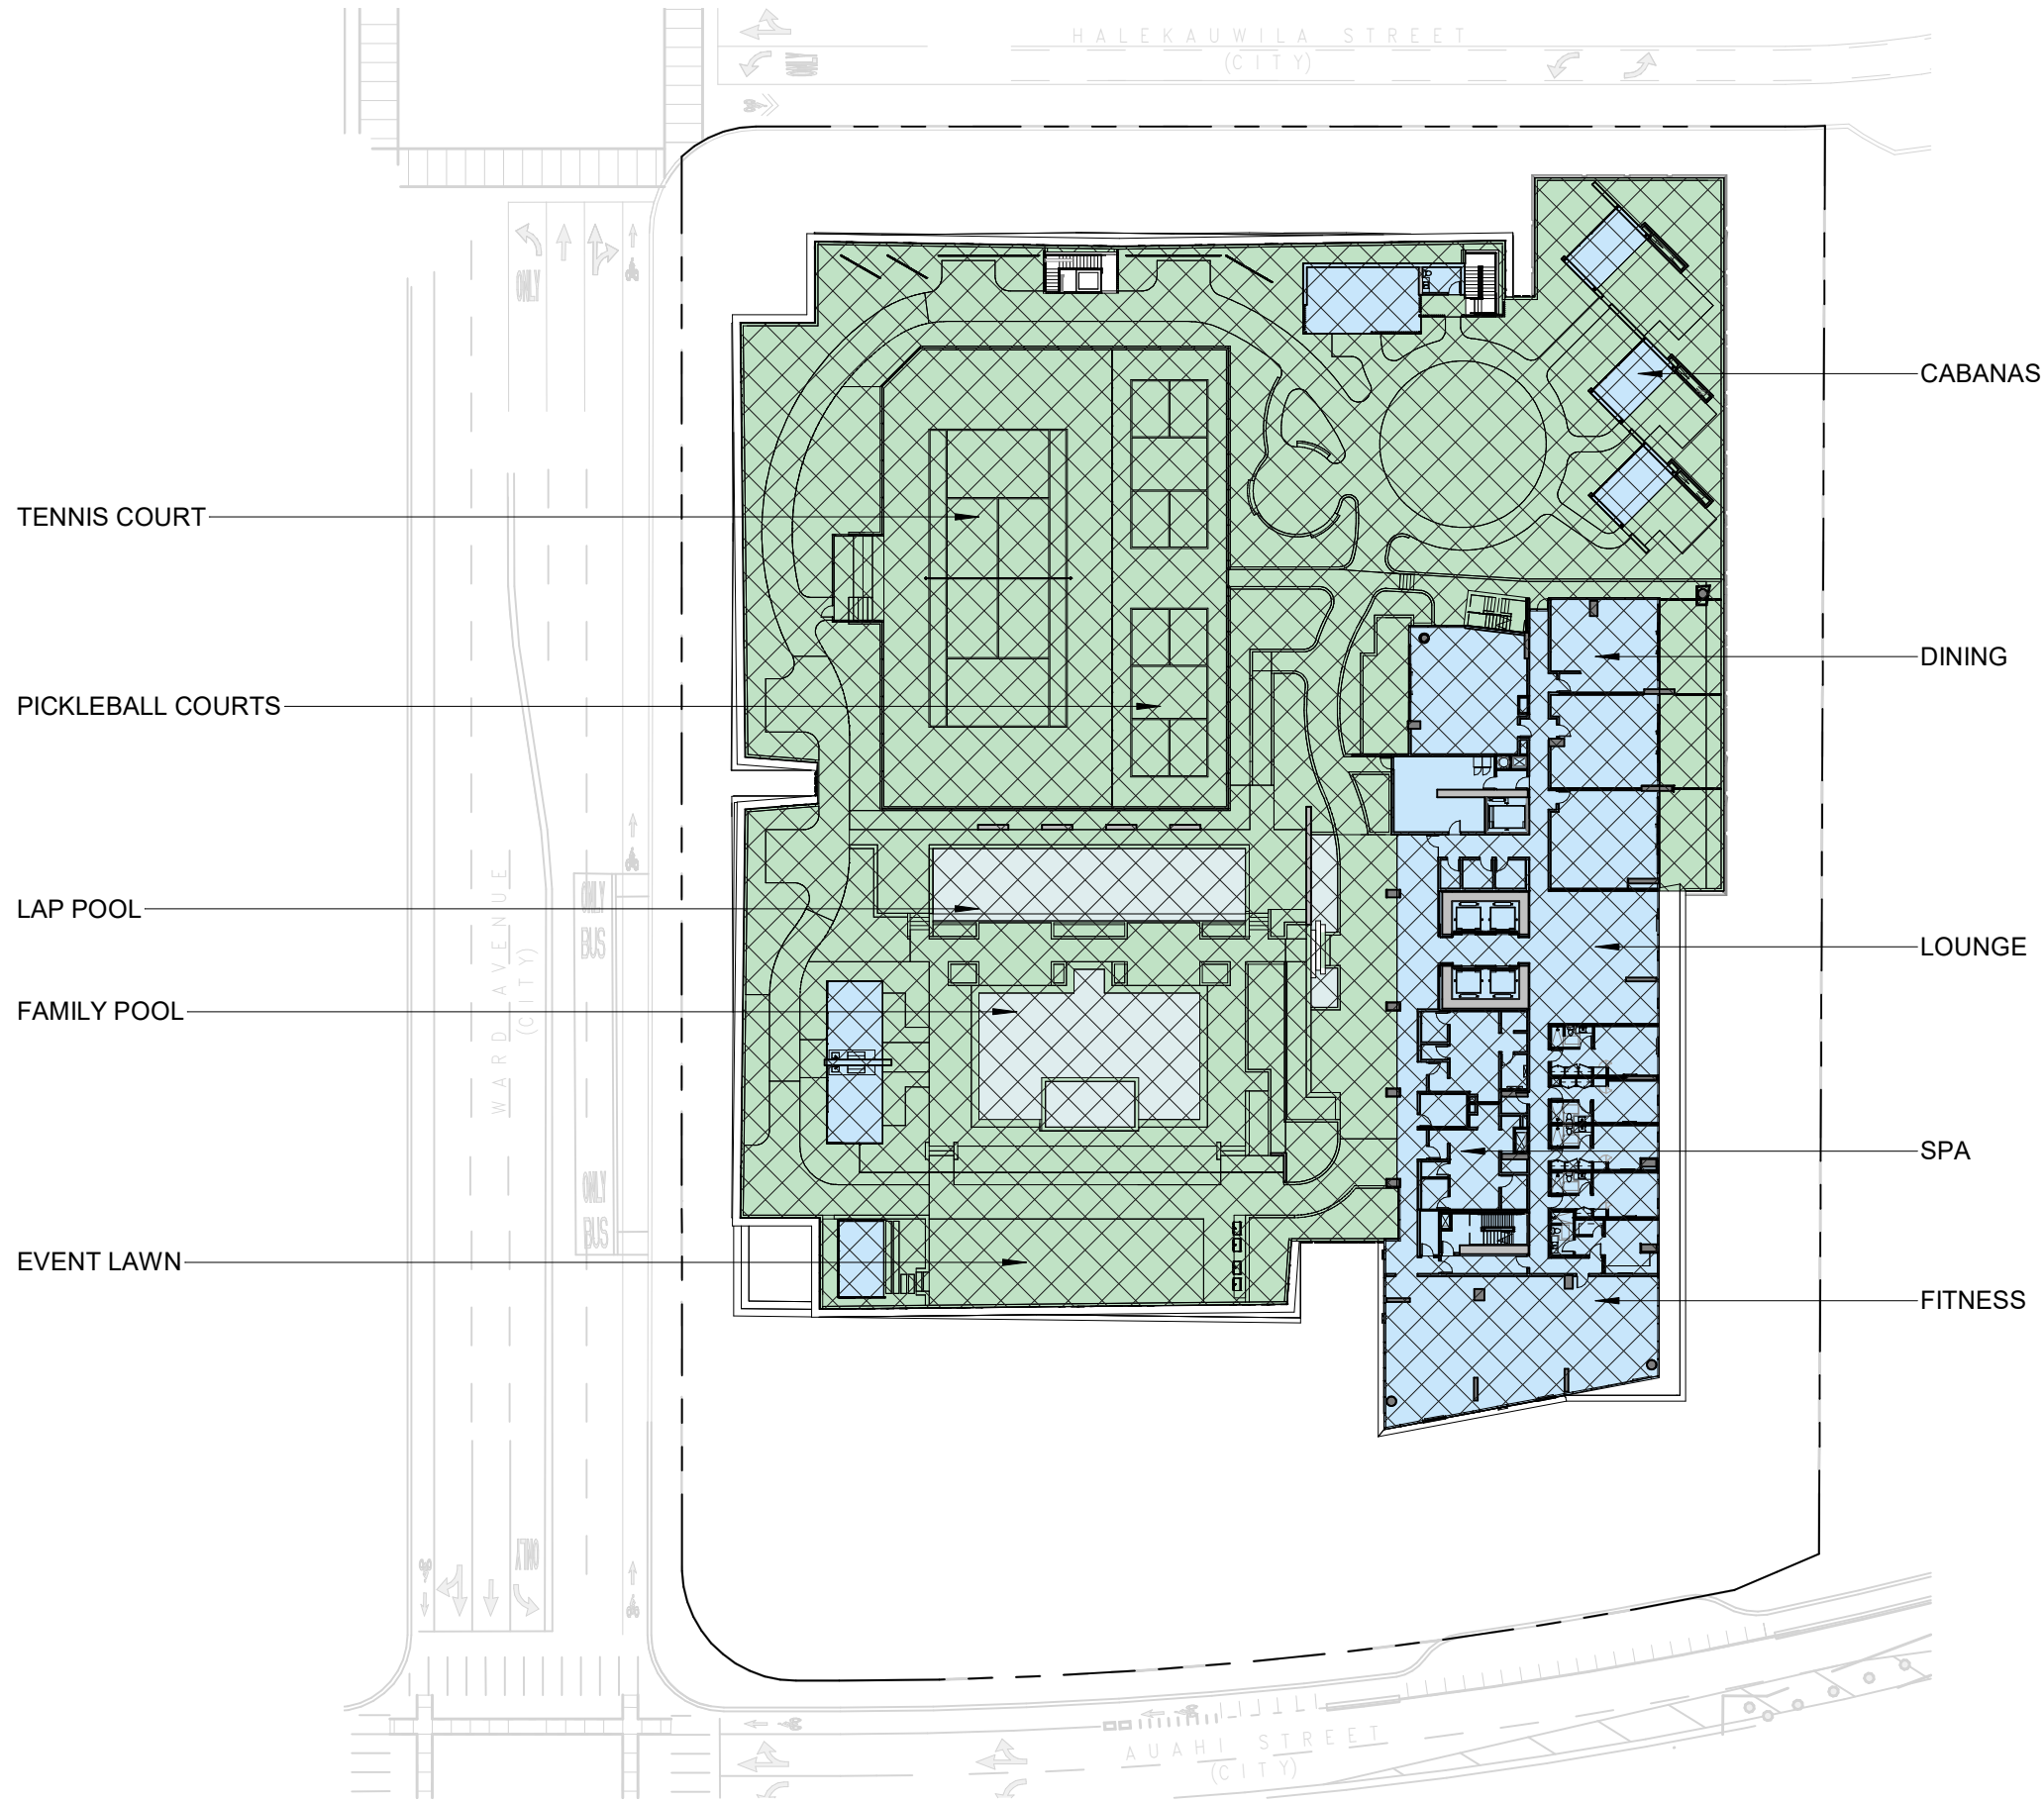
Floor Plan, Level 8 - Amenity Deck
